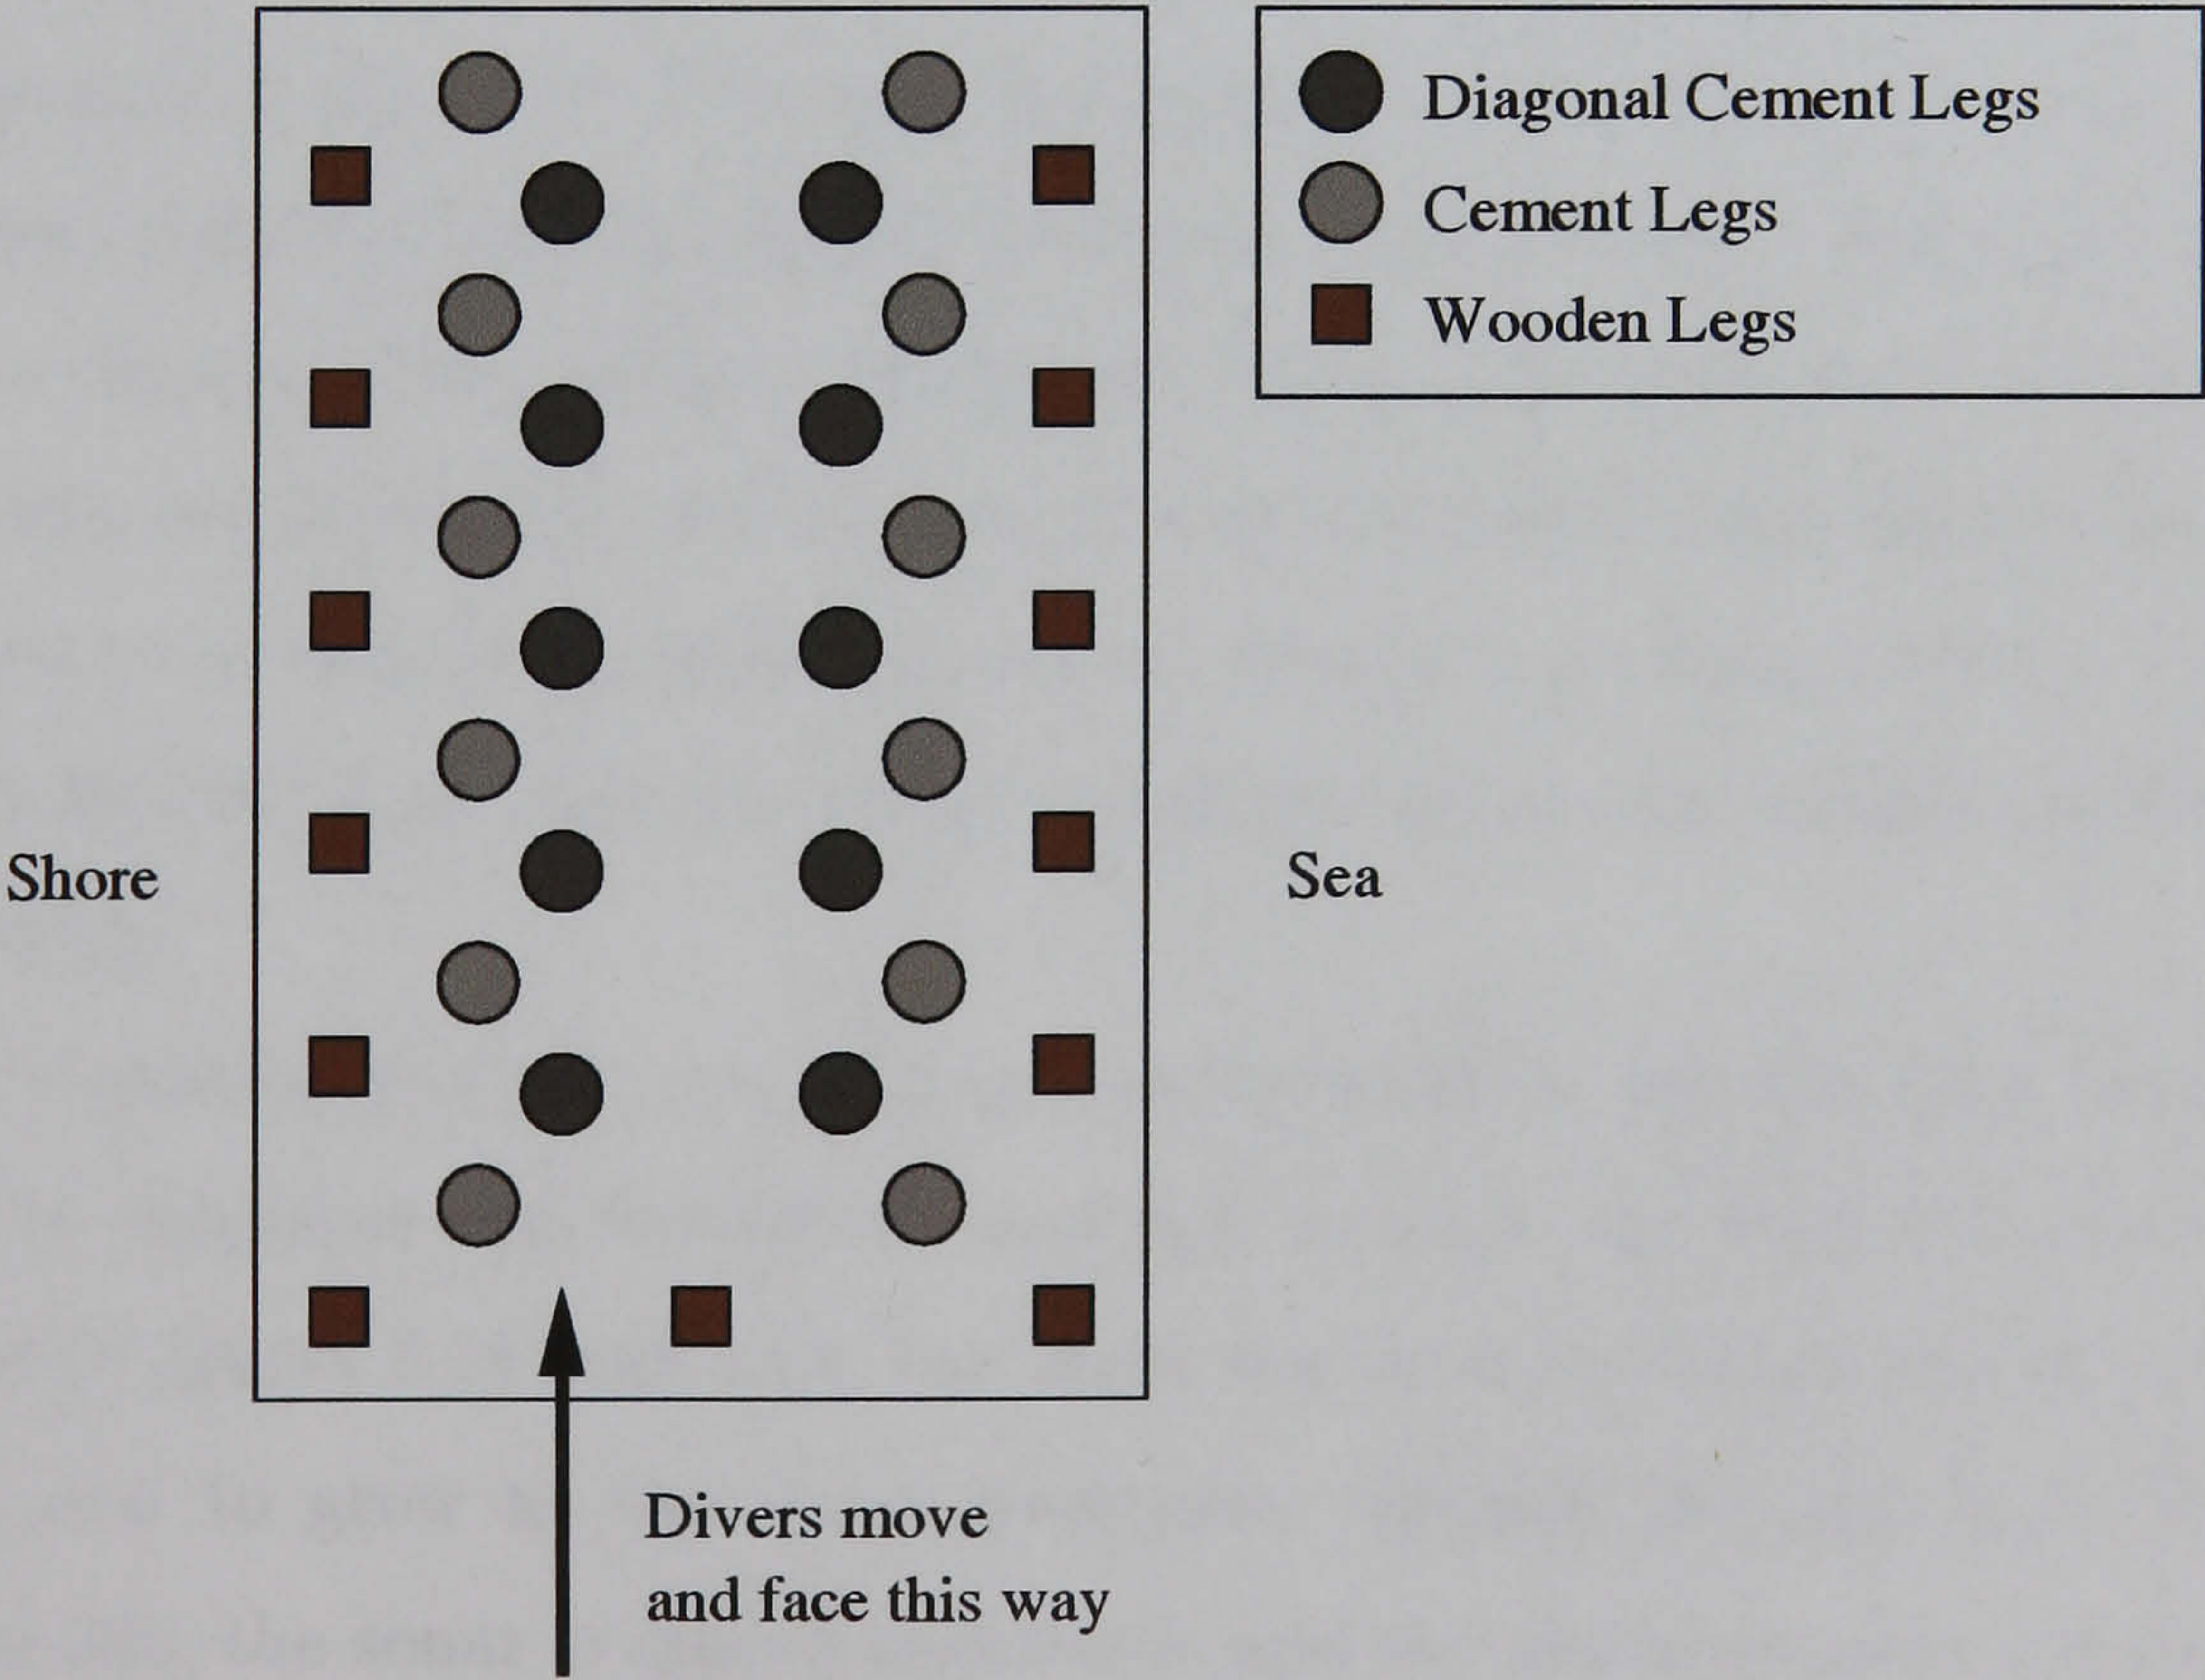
Northern Lighthouse Board Pier: A plan view of the pier (not to scale)
